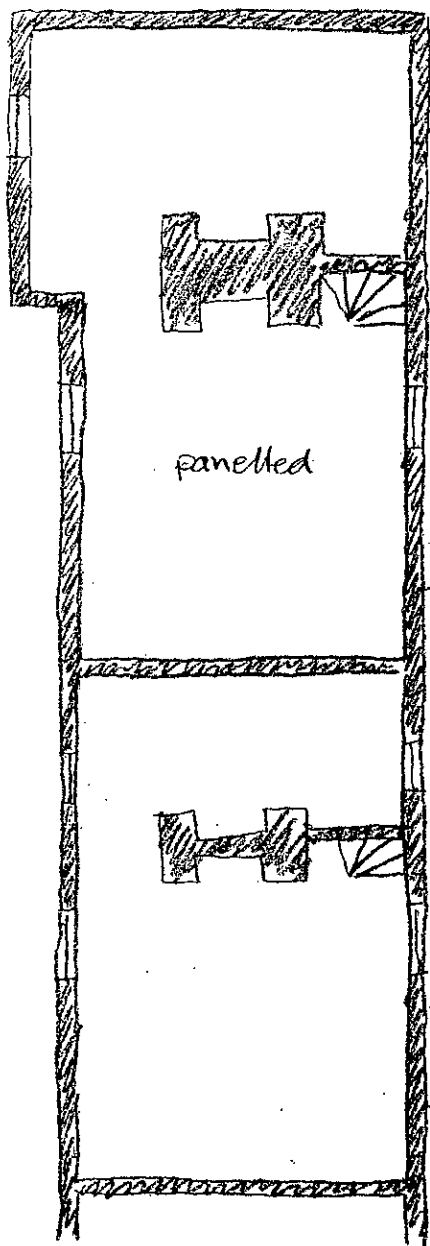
; sketch reconstruction of the seventeenth-century first floor plan.
